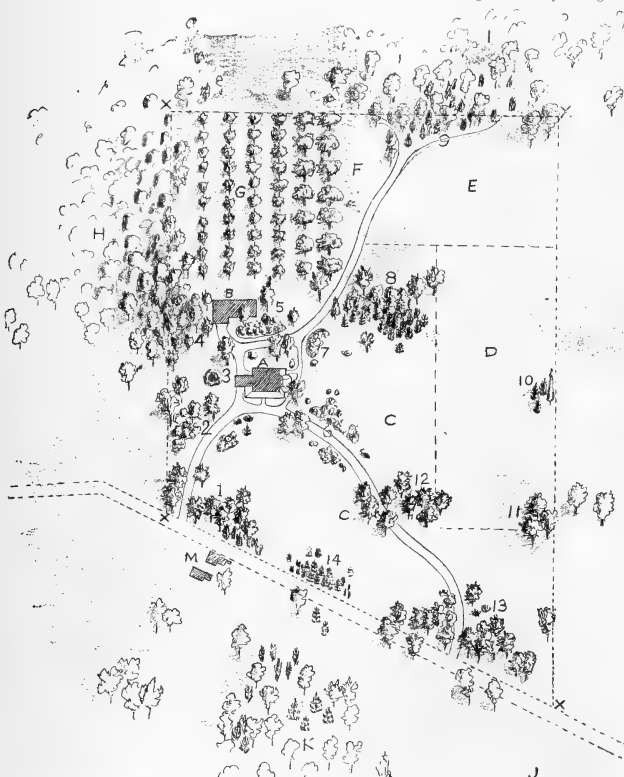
GENERAL PLAN FOR IMPROVING PLACE IN SOUTHWESTERN NEW YORK.
